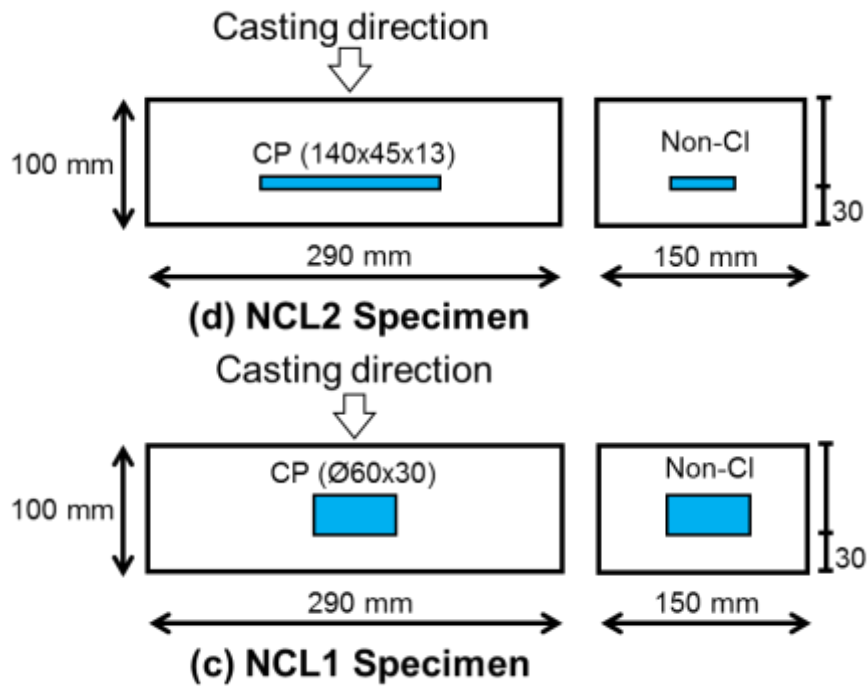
Detailed layout of concrete specimens with zinc sacrificial anode only embedded in concrete (Continued)
